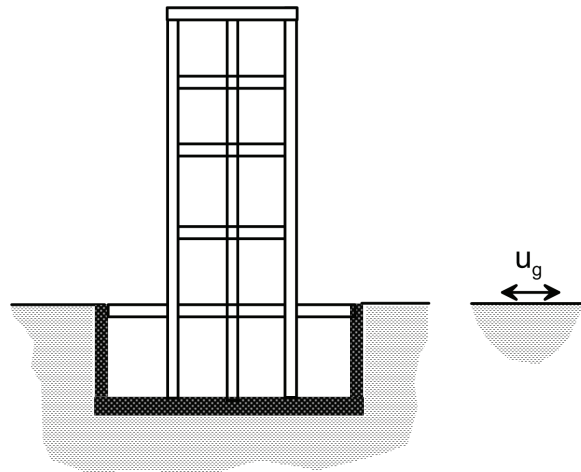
Illustration of an embedded building configuration with a basement surrounded by soil and a level grade on all sides.
